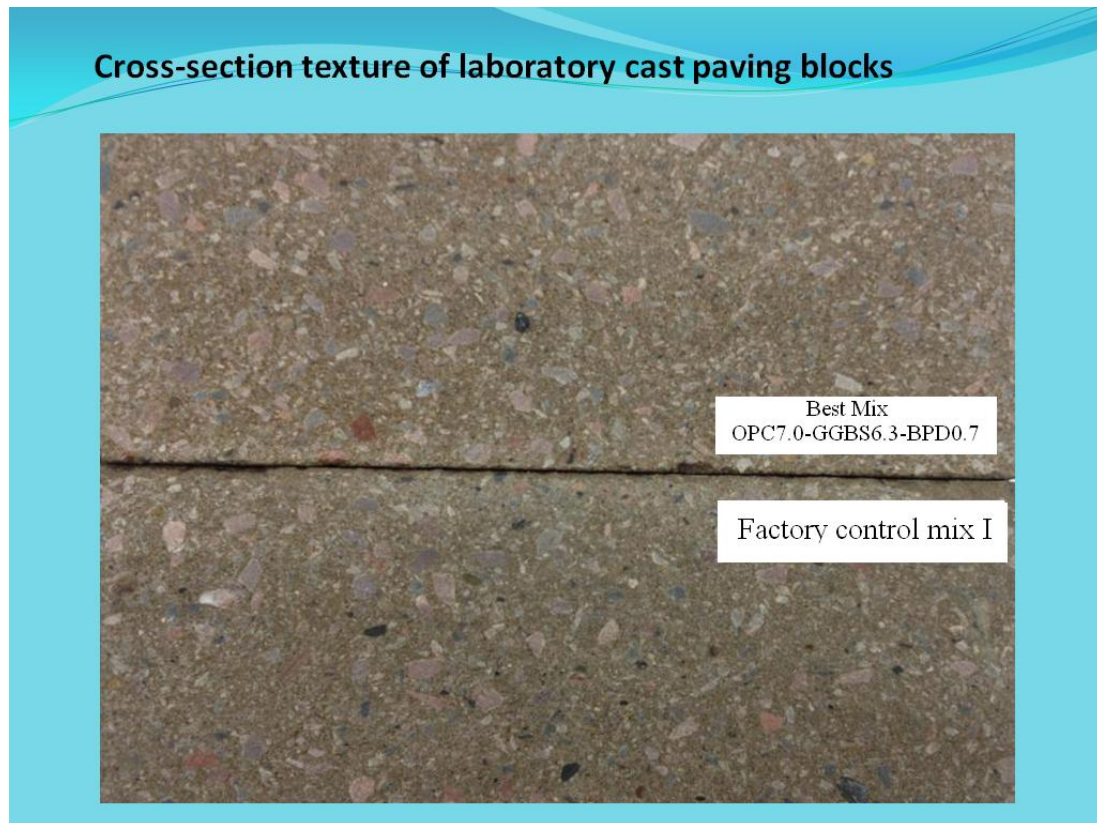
Cross-section of laboratory cast paving block between best mix and factory control mix
